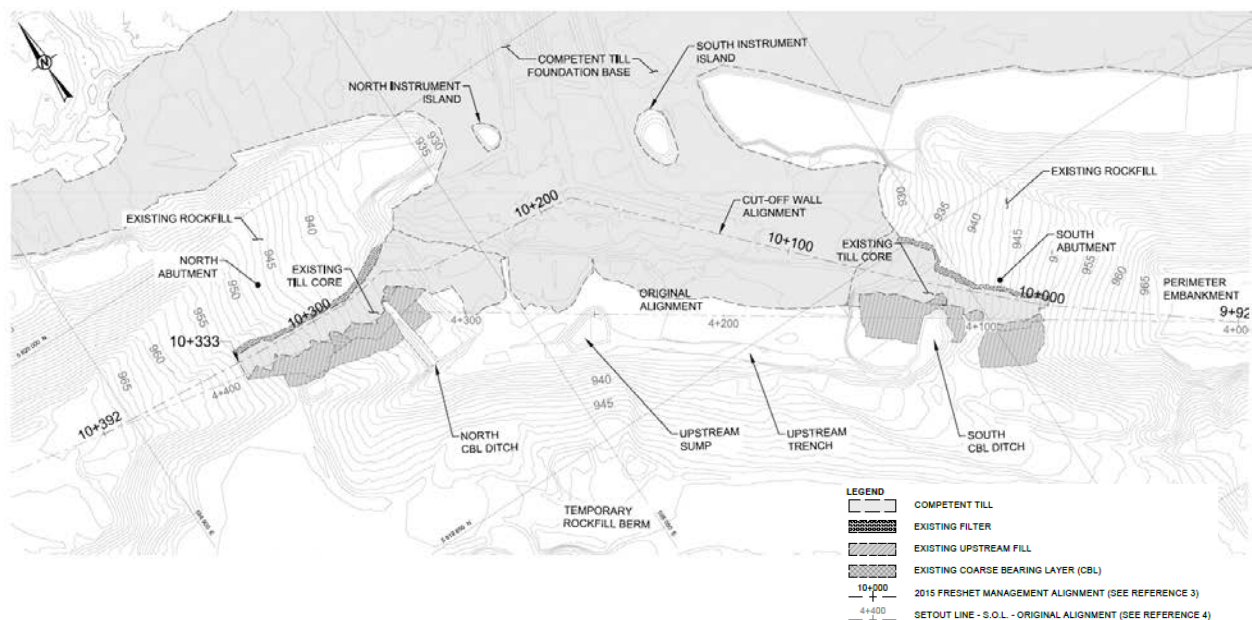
Exposed material zones on north and south abutments and as-constructed cut-off wall alignment
